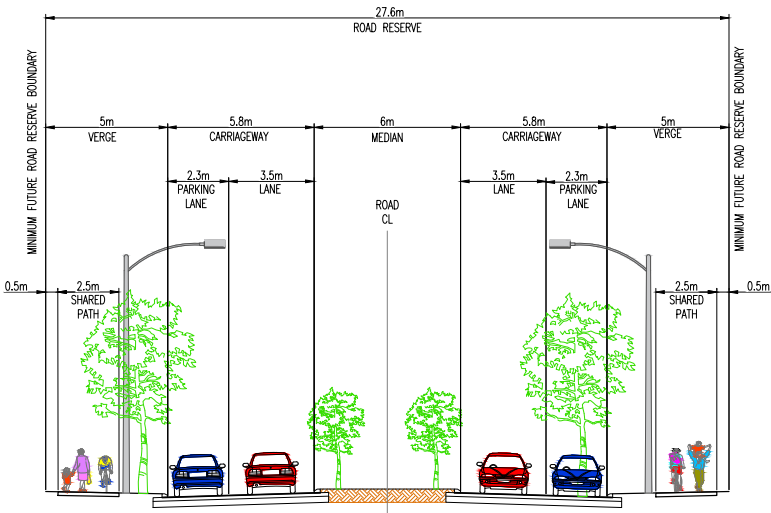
CROSS SECTION OF ACCESS STREETS A
